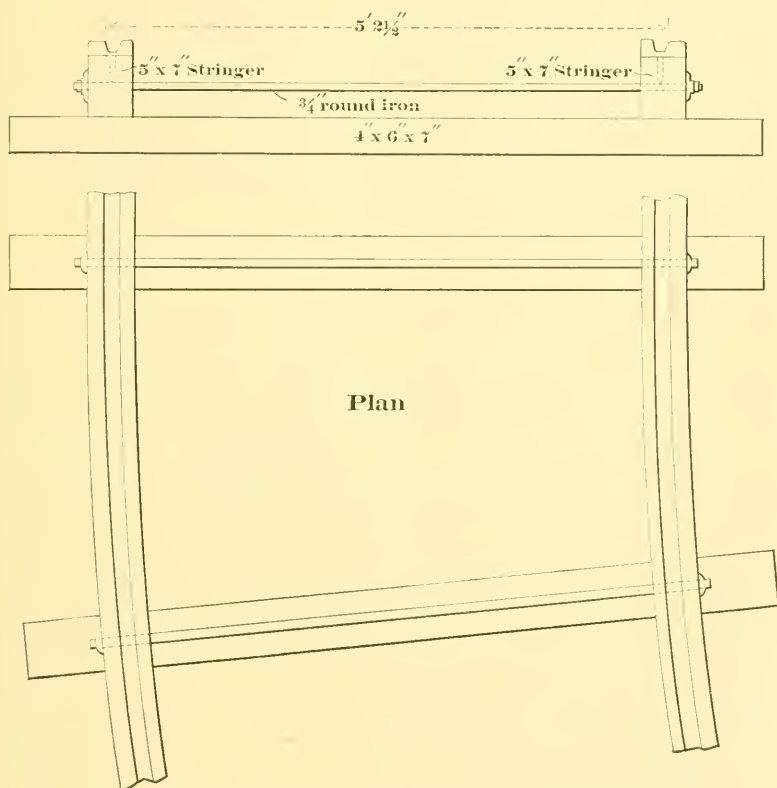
PLAN AND SECTION OF CURVED TRACK BUILT IN 1873.
